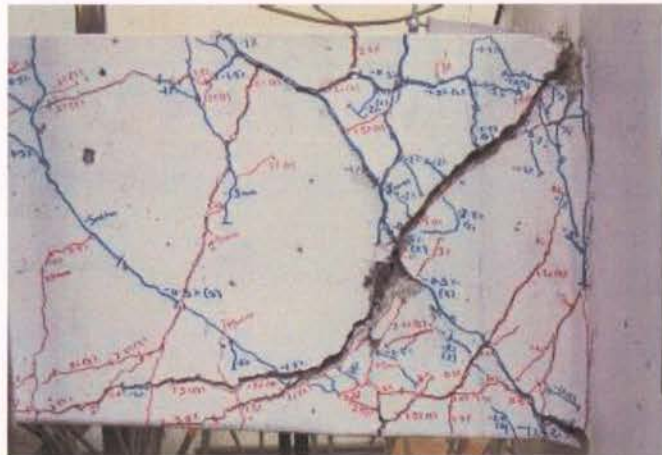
Transverse reinforcement visible through diagonal tension crack at 3.0% drift (A1)
